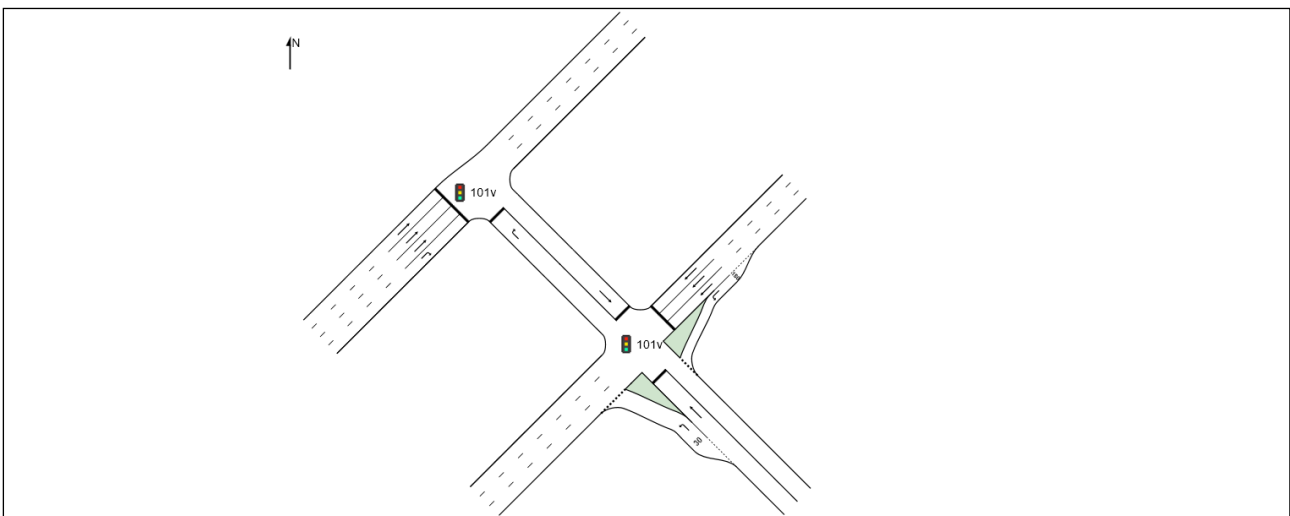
SIDRA Geometry: Monaro Highway / Tralee Street – Potential Upgrade Layout
